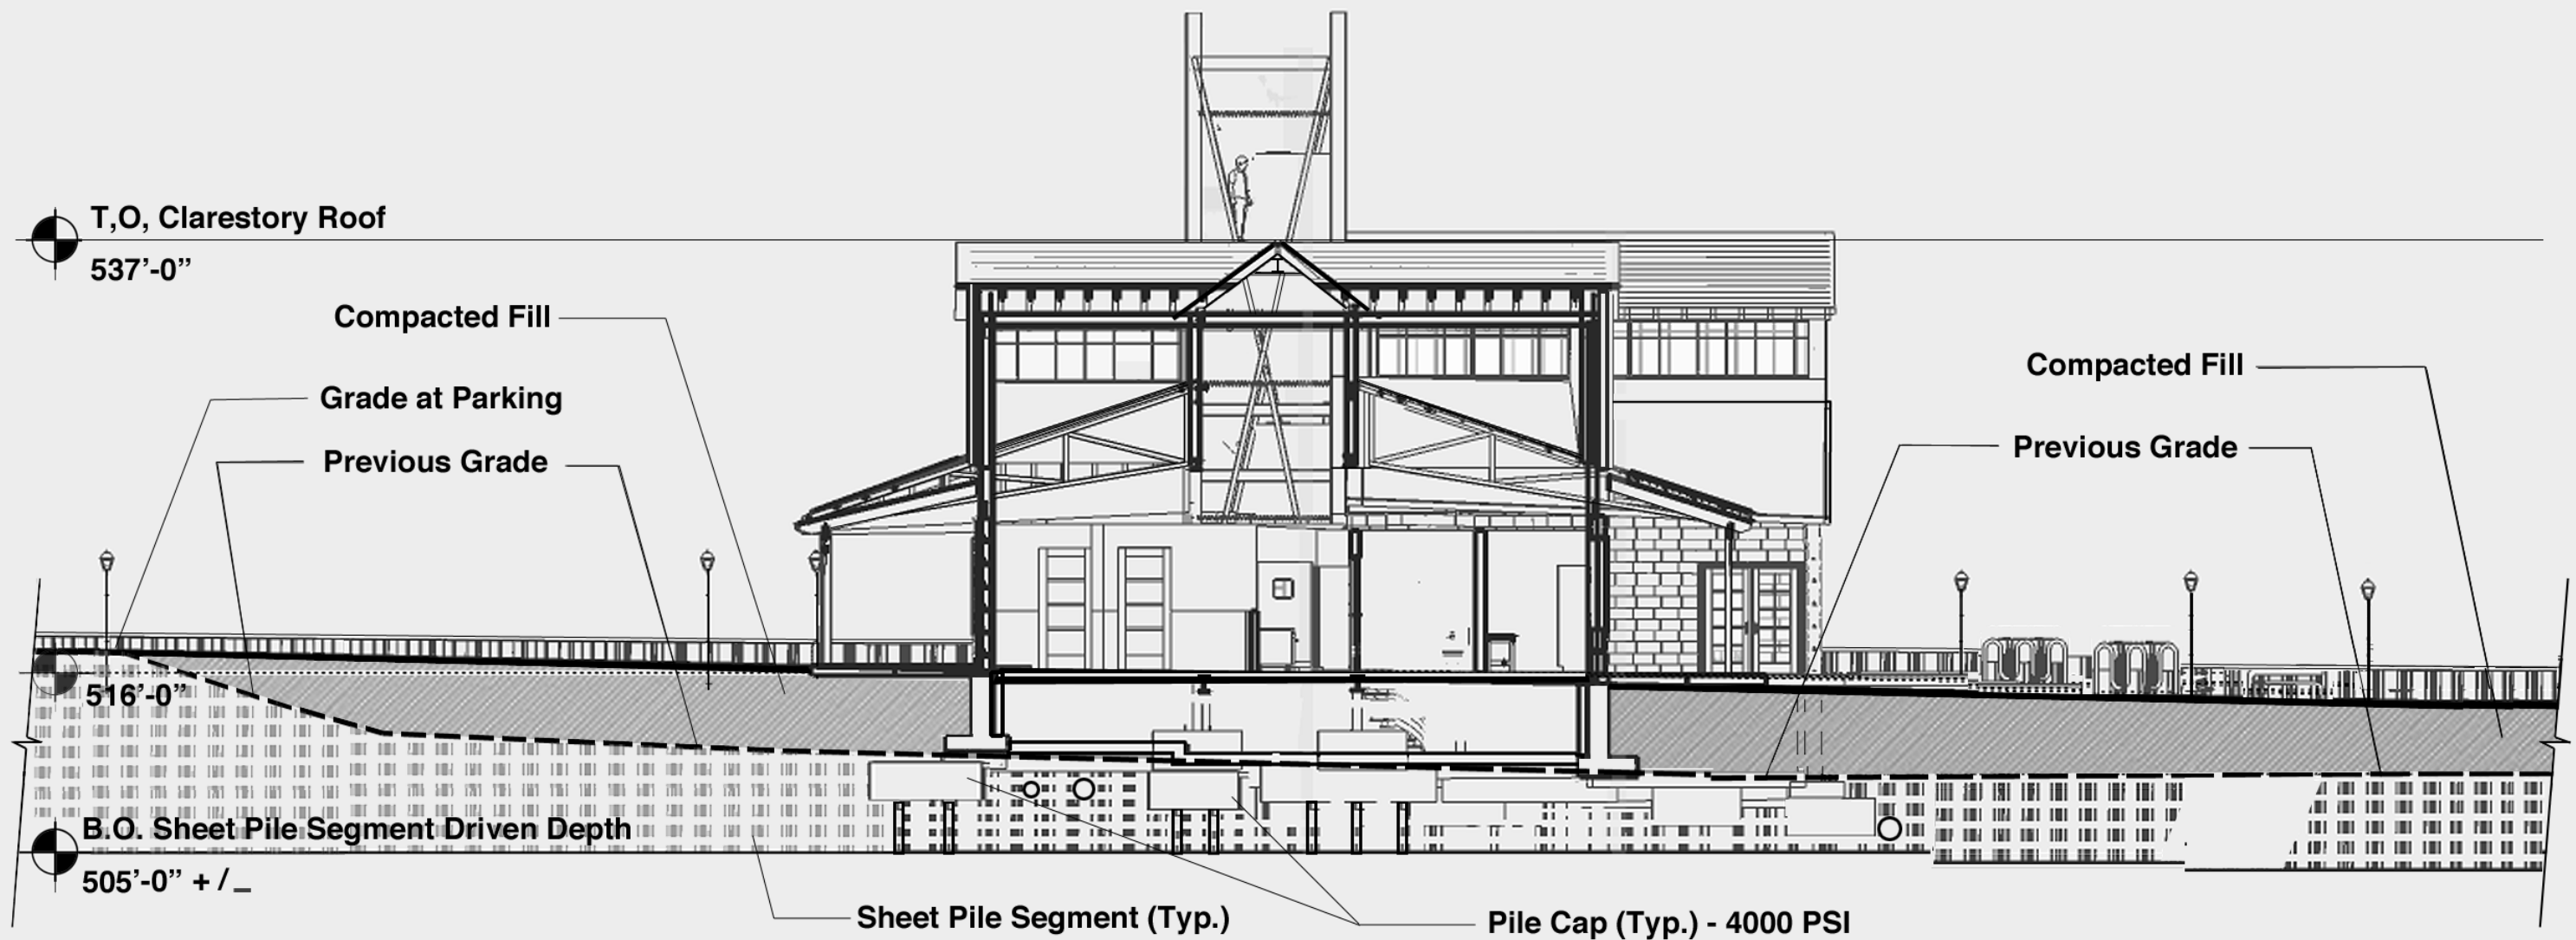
Building Section along NW-SE cut (showing Footbridge Beyond). Drawn by J. Nicholson
